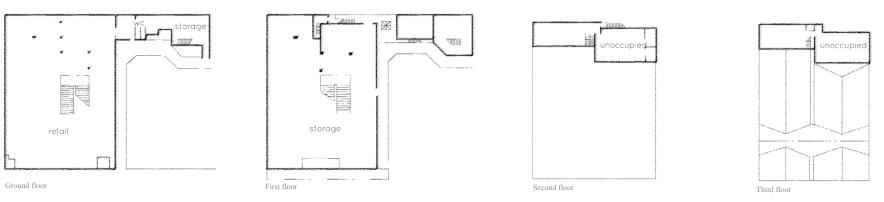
Current building layout - not to scale (Space Capades, 2013 edited by Author)
